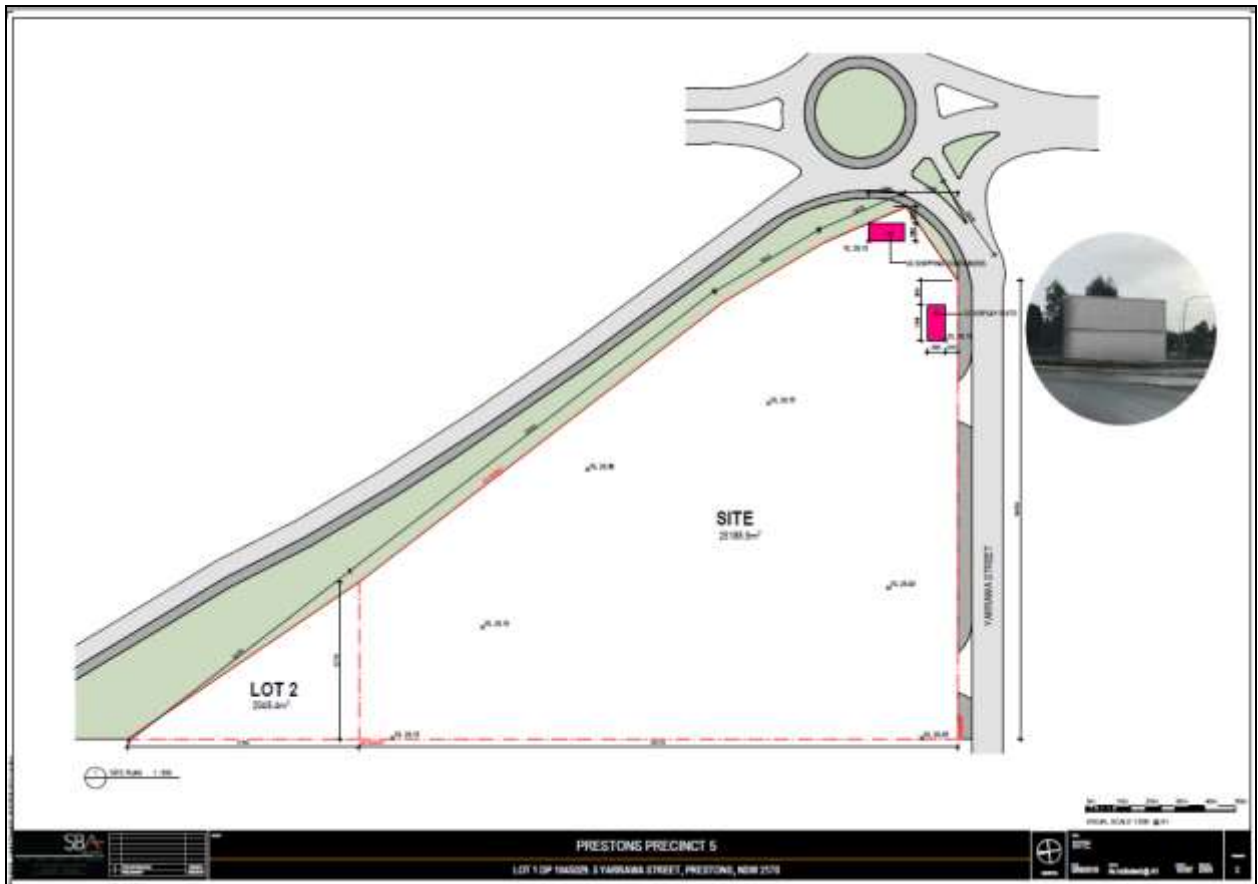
Site Plan with location of proposed display suite and advertising signage (north to left)
